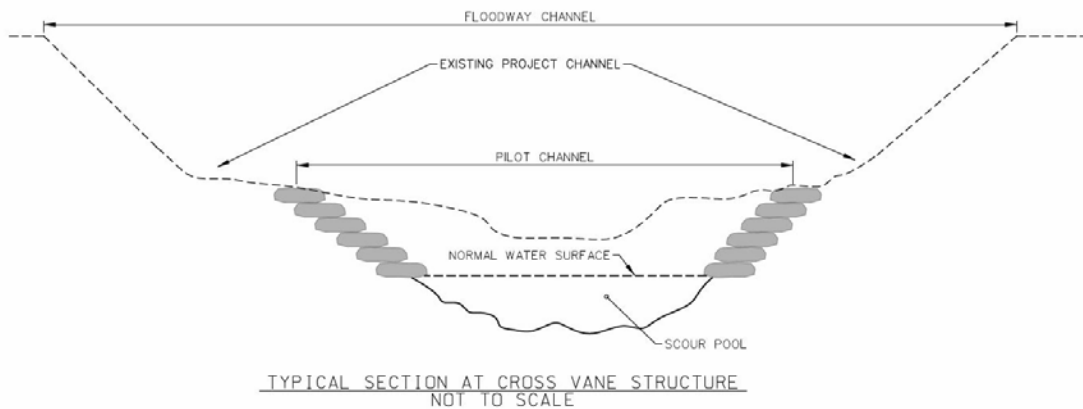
Typical Section for Rock Cross Vanes in the Westside Creeks Recommended Plan
